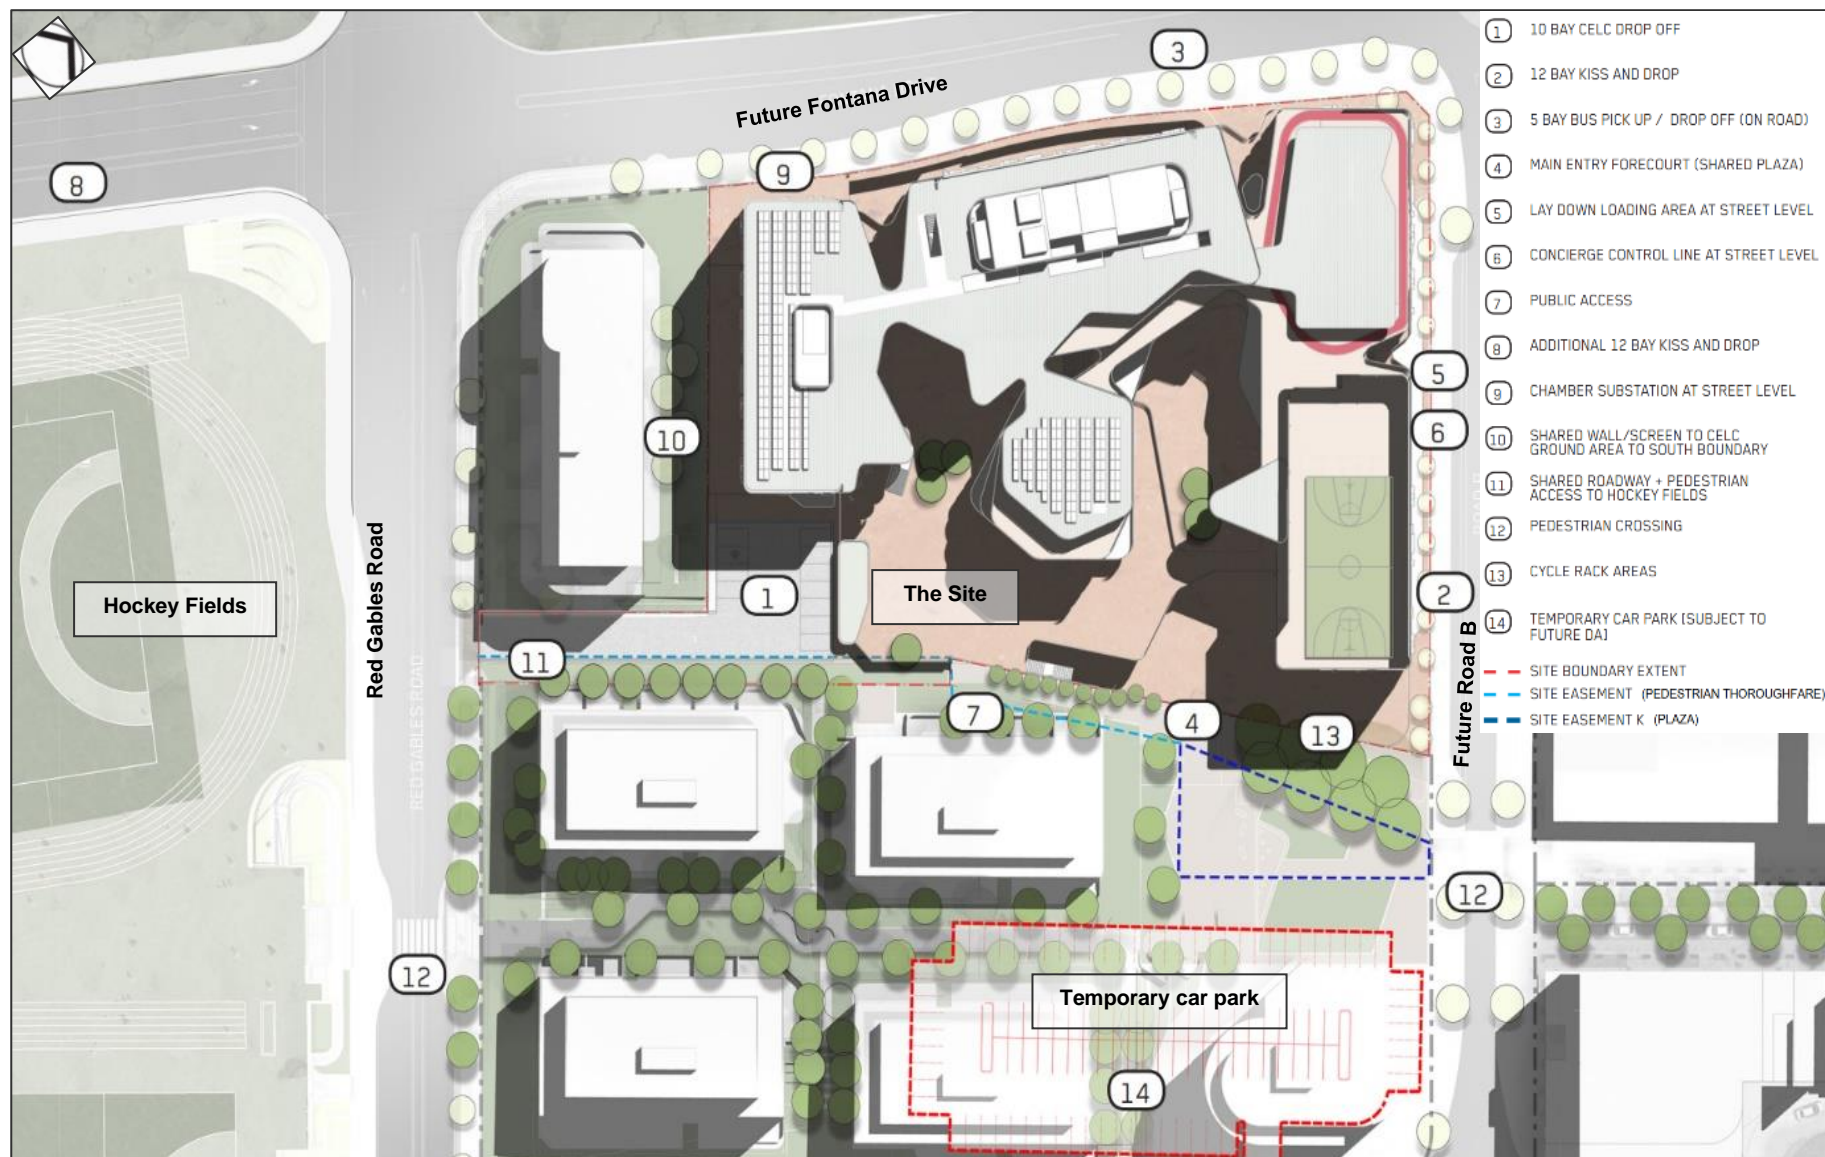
| Proposal contextual site layout (Source: Applicant's SRtS)
